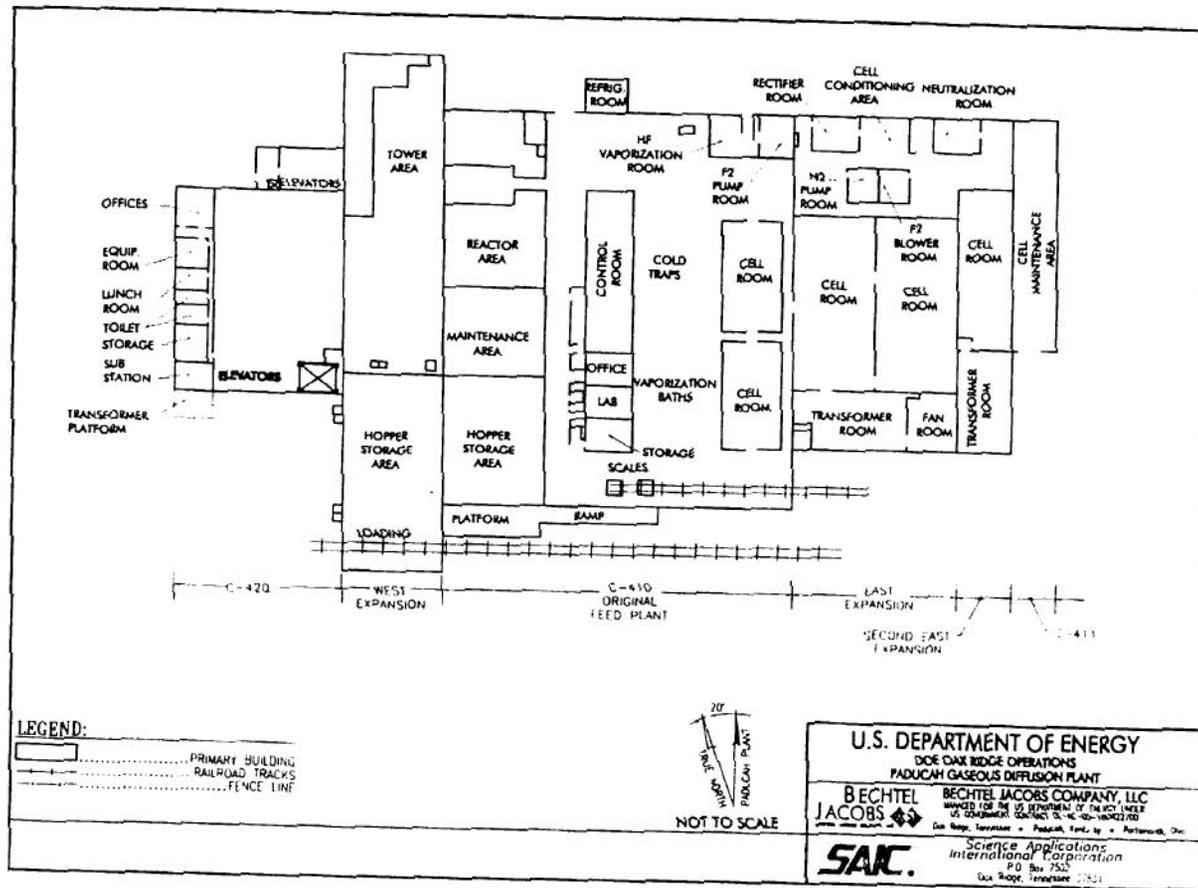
Floorplan of the C-410 Complex showing each section as it was built or expanded.
